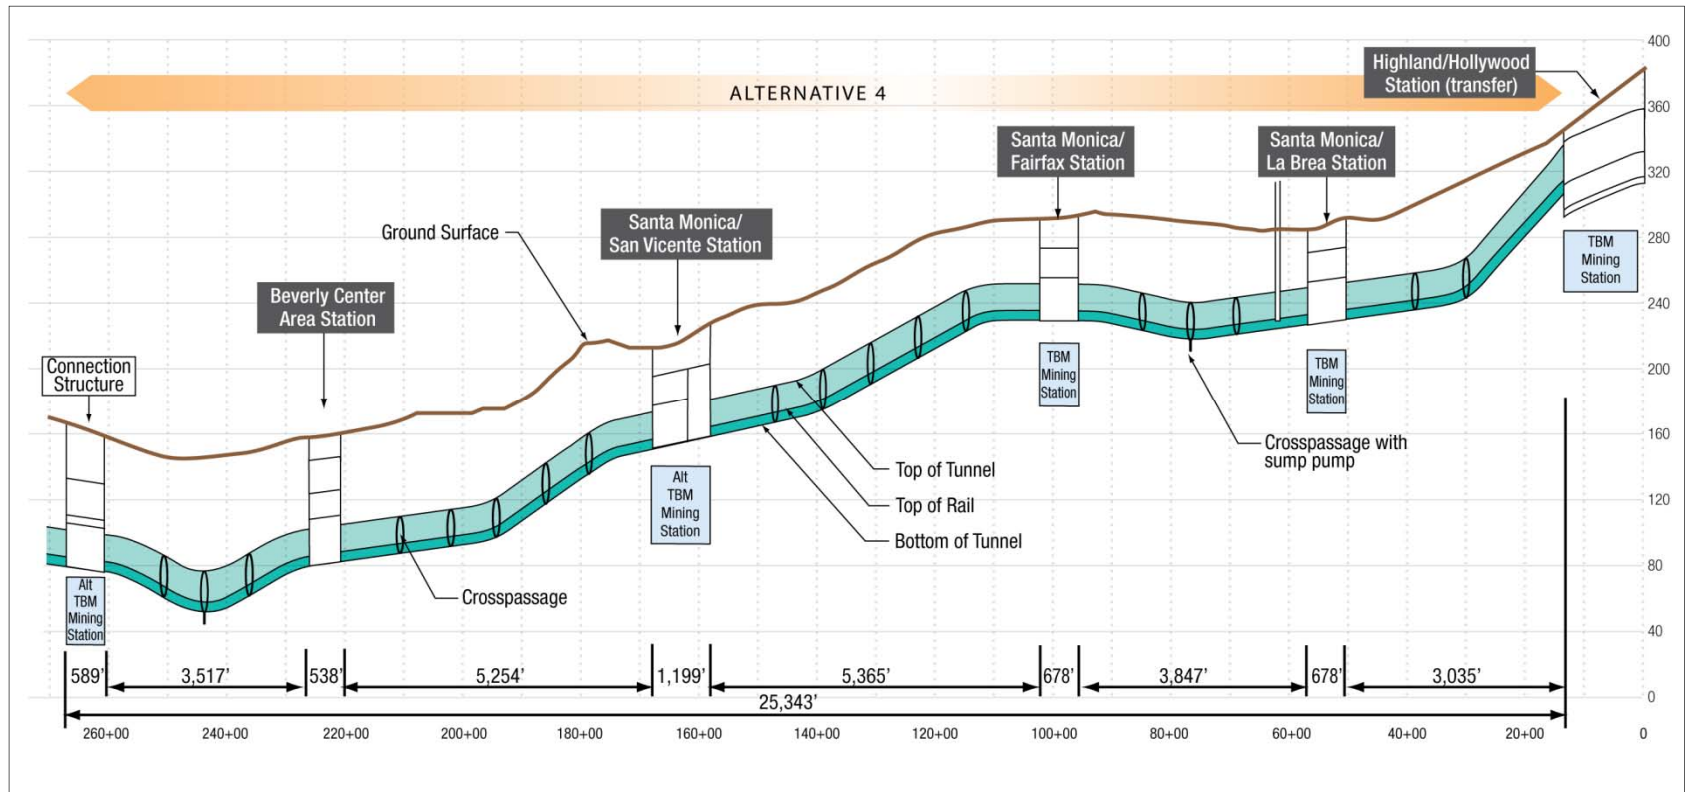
West Hollywood Extension, Hollywood/Highland to Connecting Structure
